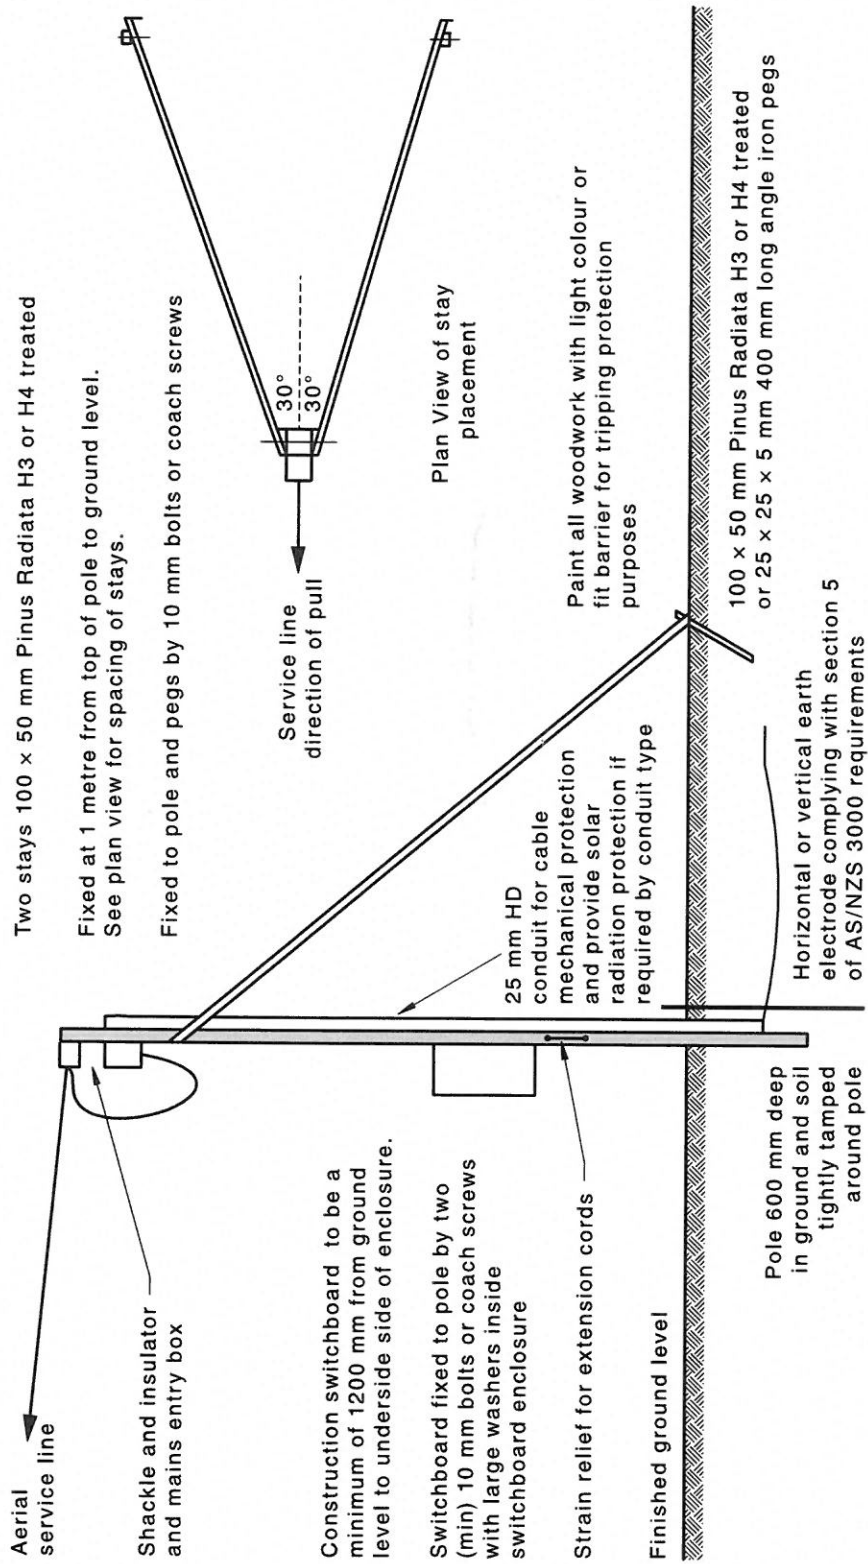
TYPICAL CONSTRUCTION SWITCHBOARD MOUNTING ARRANGEMENT WITH OVERHEAD AERIAL SUPPLY
